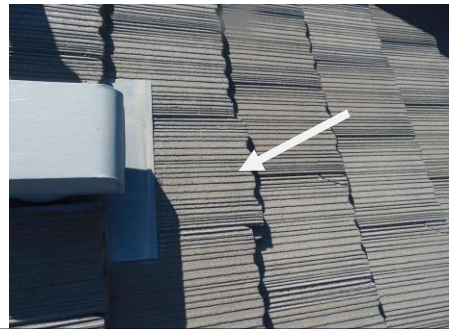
SHIFTED, LOOSE TILE, BELOW EXHAUST
